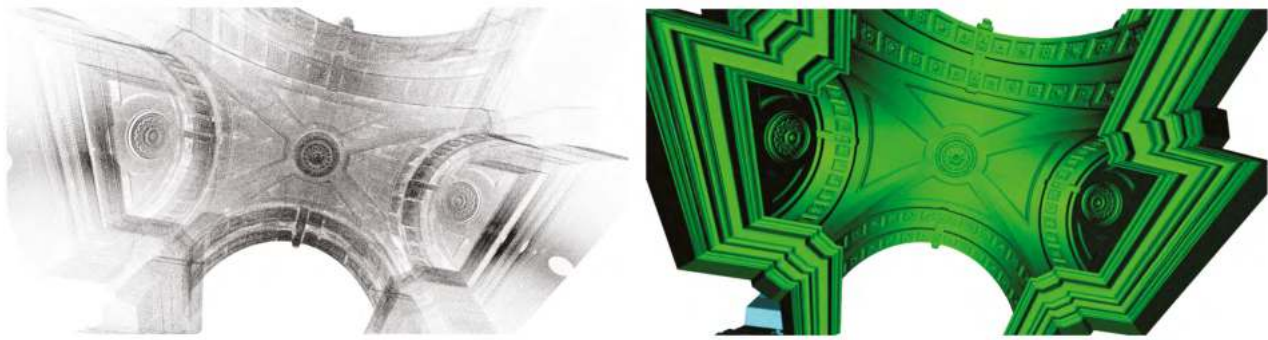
Recapturing the operative layout of the architect through plan and sections. Source: author, 2024.
